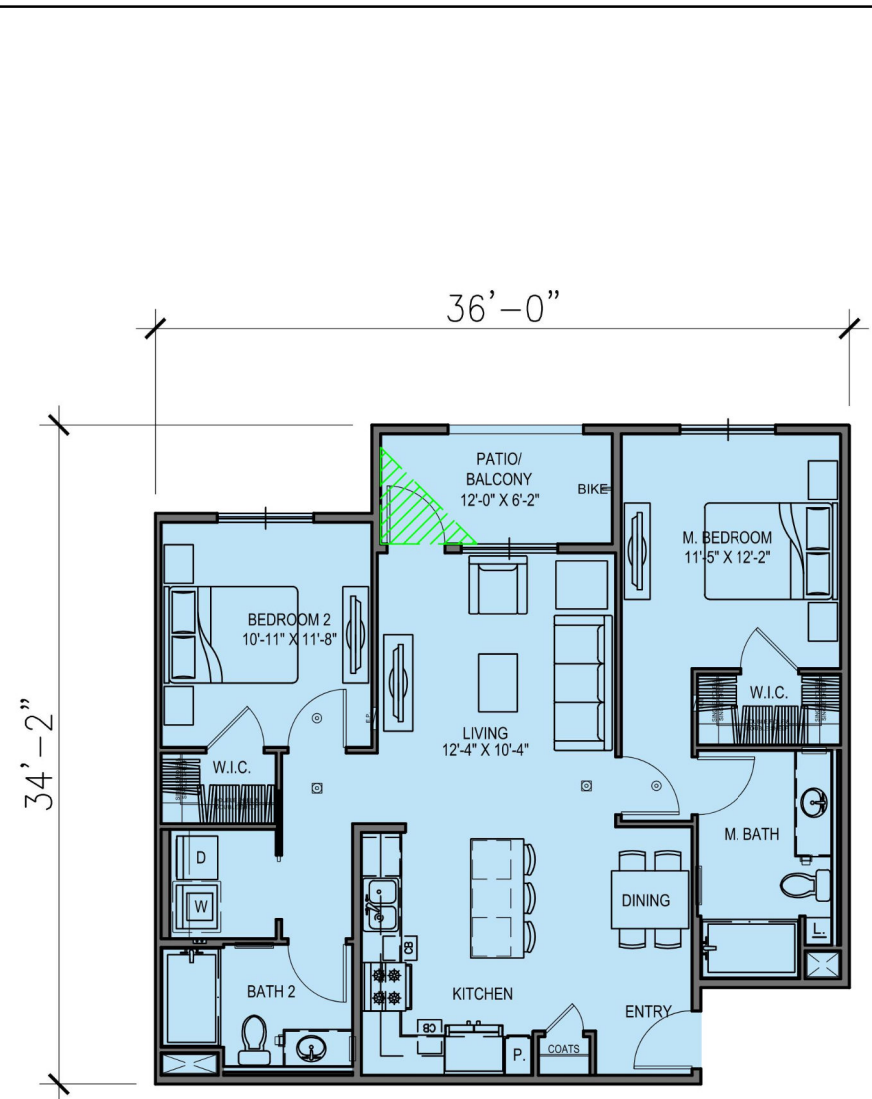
Proposed Floor Plans [Garden Style Plans 1 of 2]
